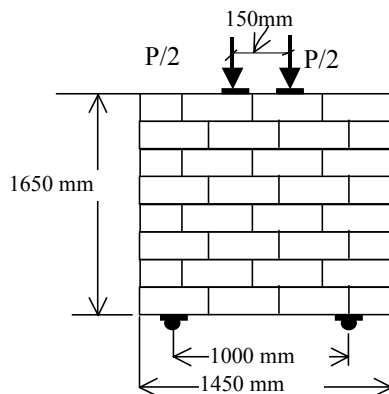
The test setup and dimensions of the in-plane vertically loaded block wall specimen.
